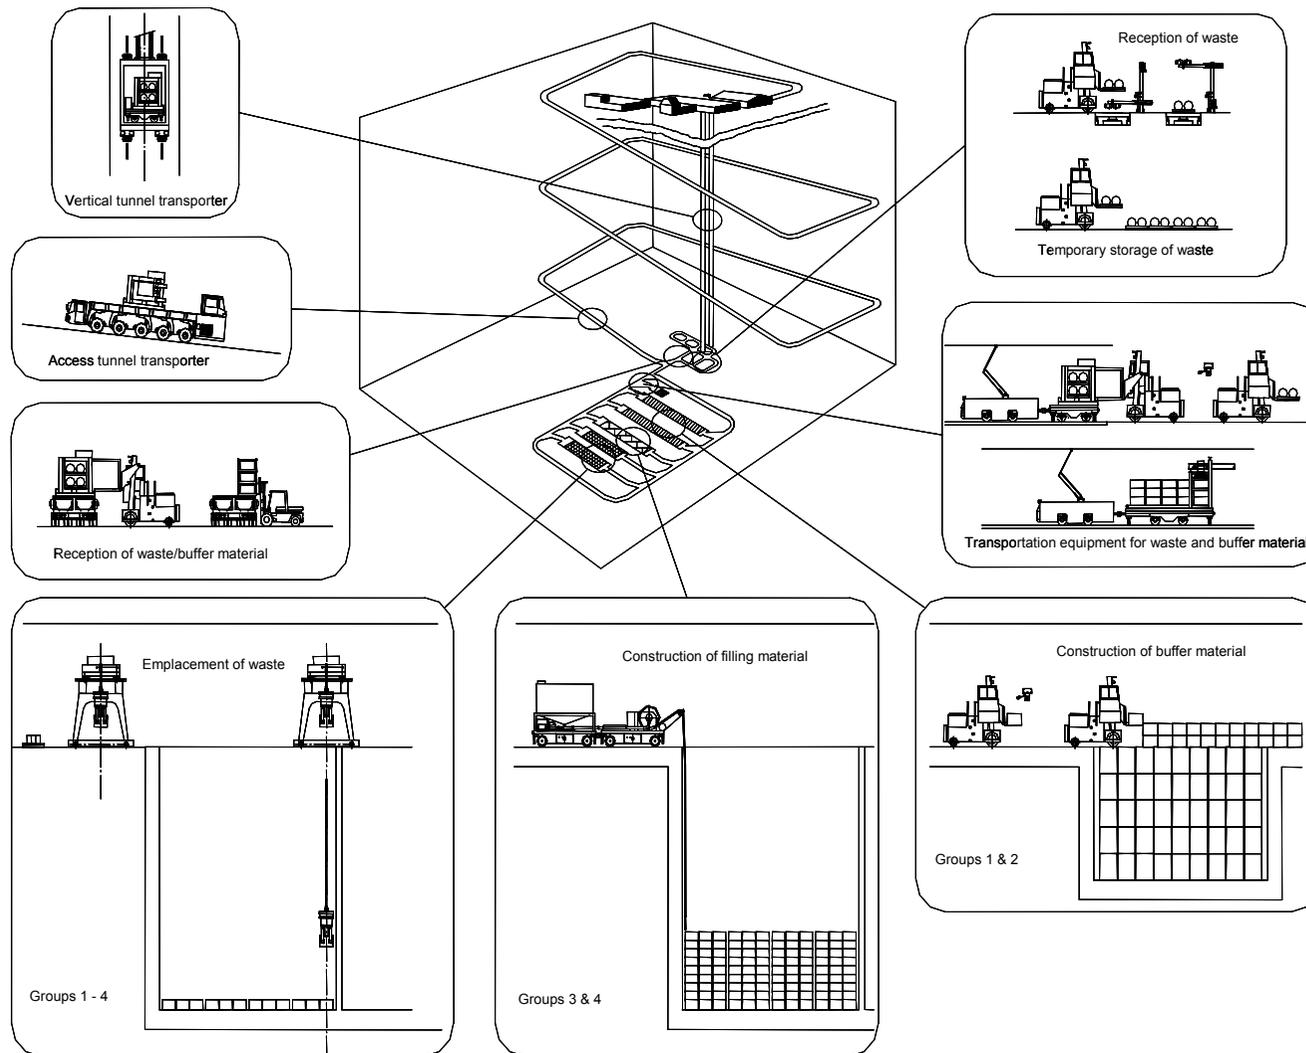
Overall view of handling equipment for underground facility (horseshoe-shaped disposal tunnel)
